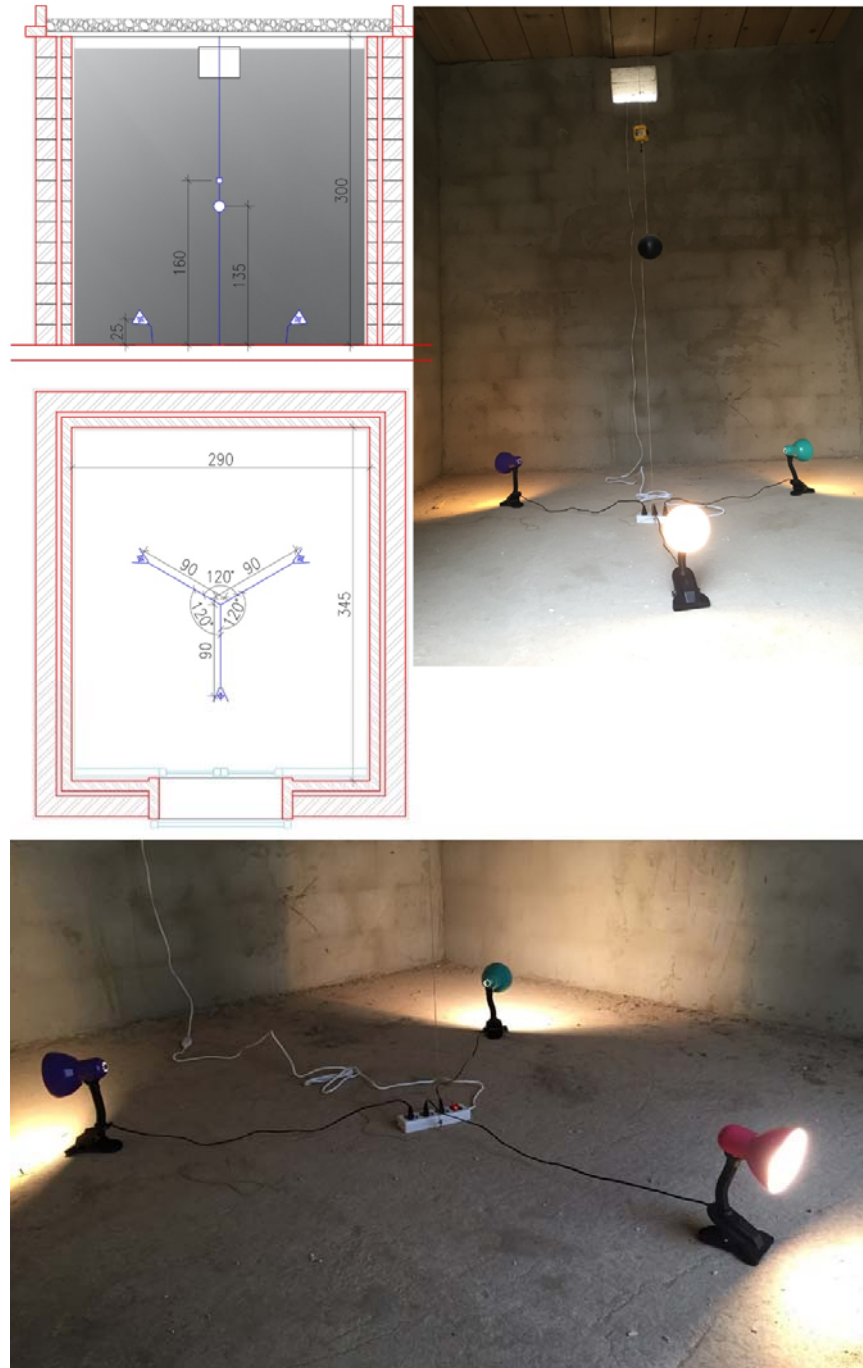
Technical drawings and photos of 3x 100W incandescent electrical bulbs layout within the test cells.
